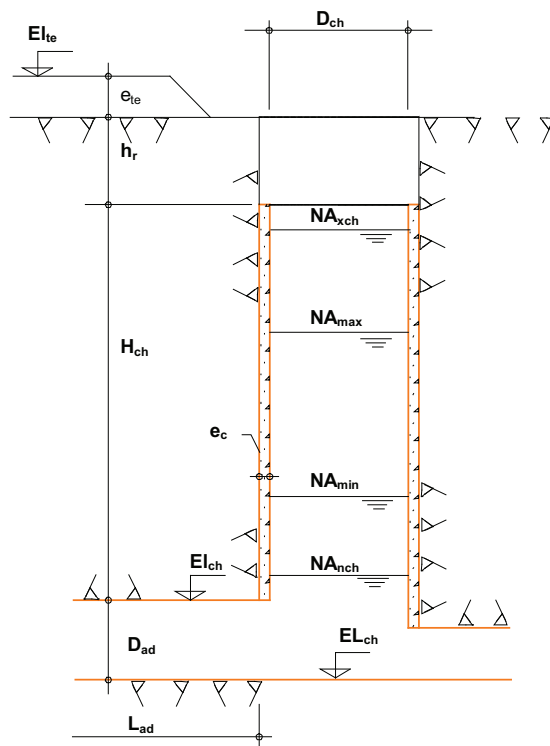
Typical cross-section of a surge tank.
